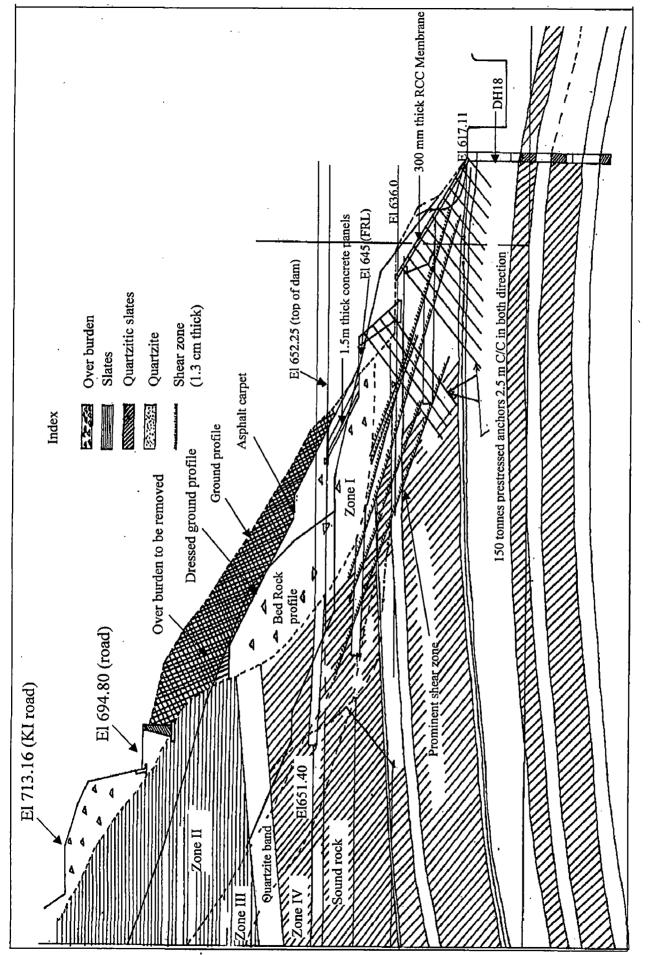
Geological section also covering details of anchors at 70 m u/s of dam axis
